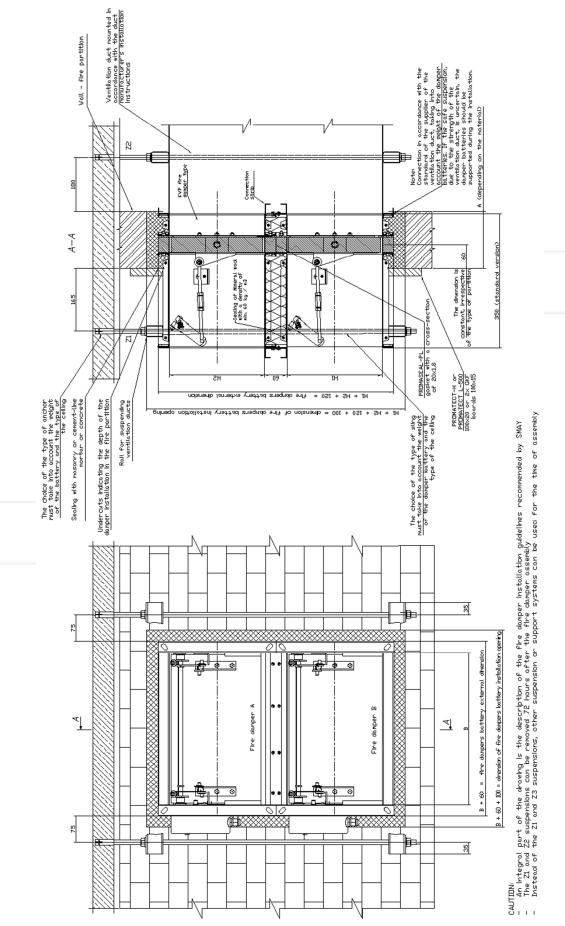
Installation of a battery consisting of two fire dampers KWP in vertical arrangement in wall
